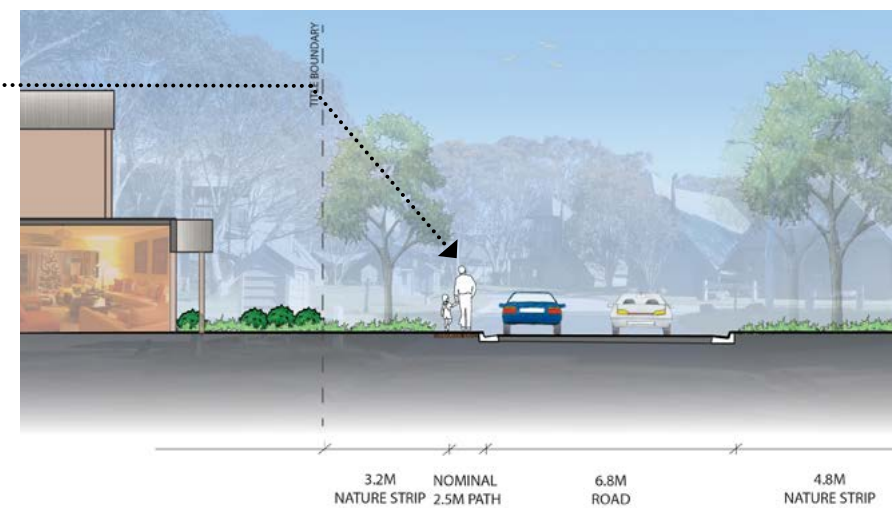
Proposed Big Muster Drive - Residential Precinct - Tower Road to Scrubbers End
